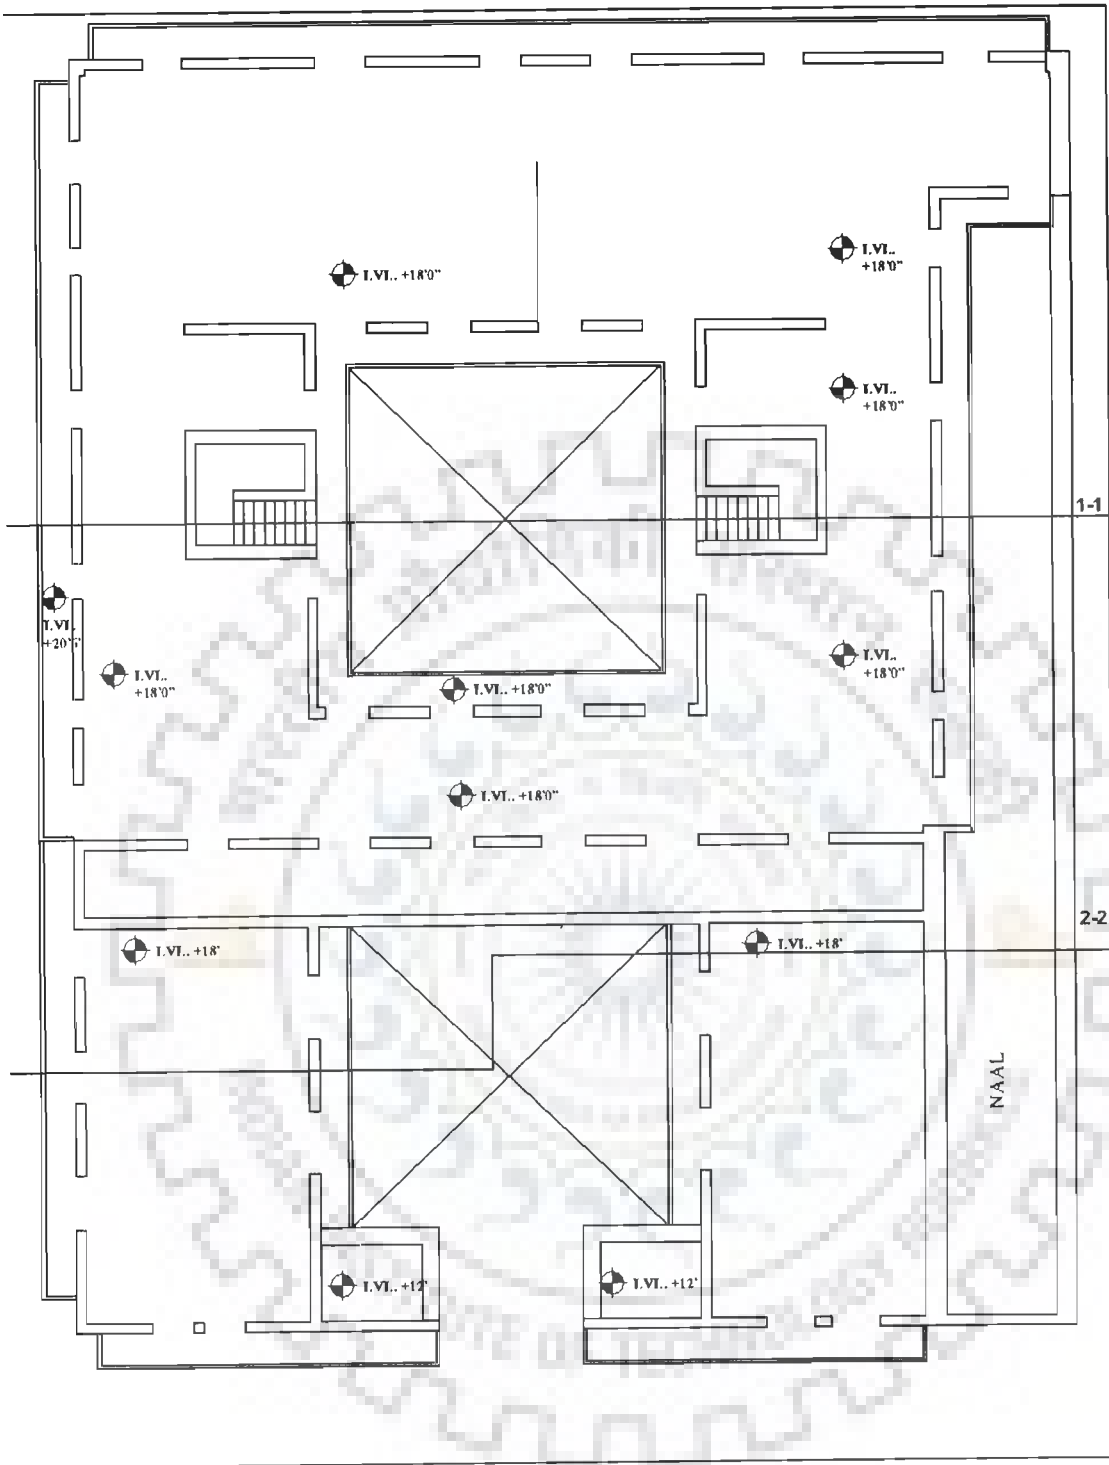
Mezzanine Floor Plan for Upper Ground Level
